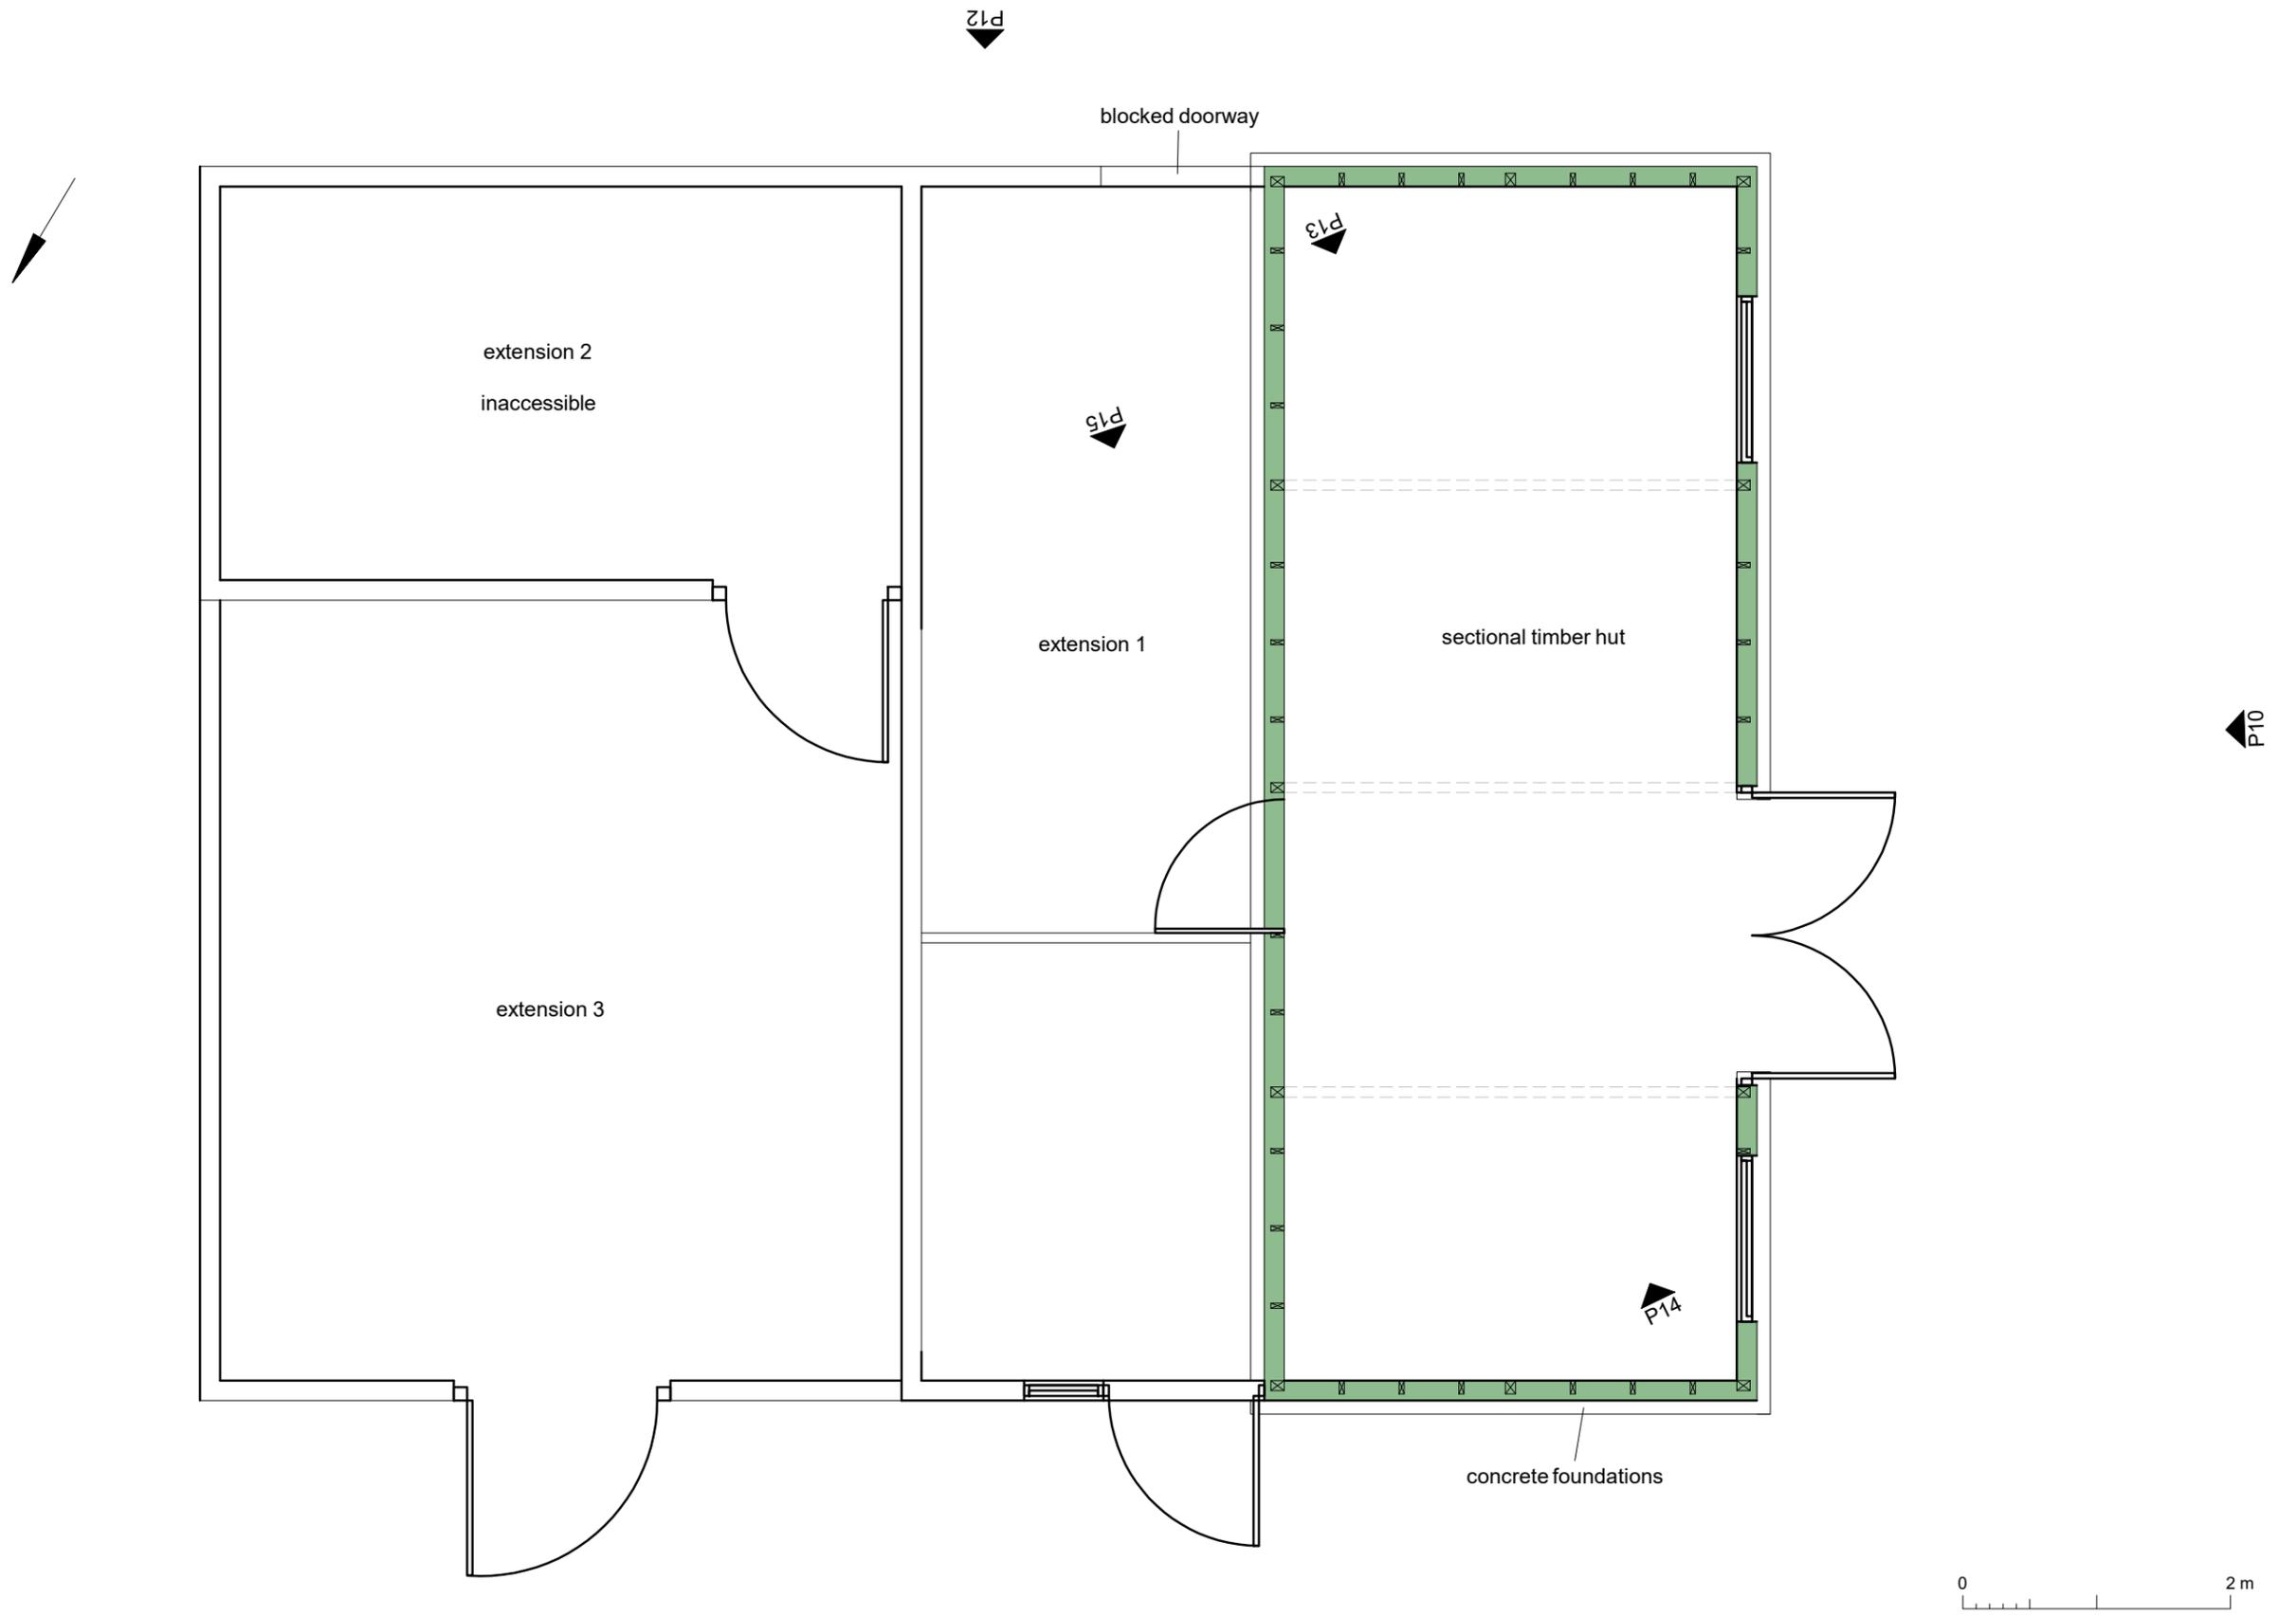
Sectional timber hut floor plan. The original footprint of the hut highlighted in green. Location and direction of photographs reproduced in the text shown.
